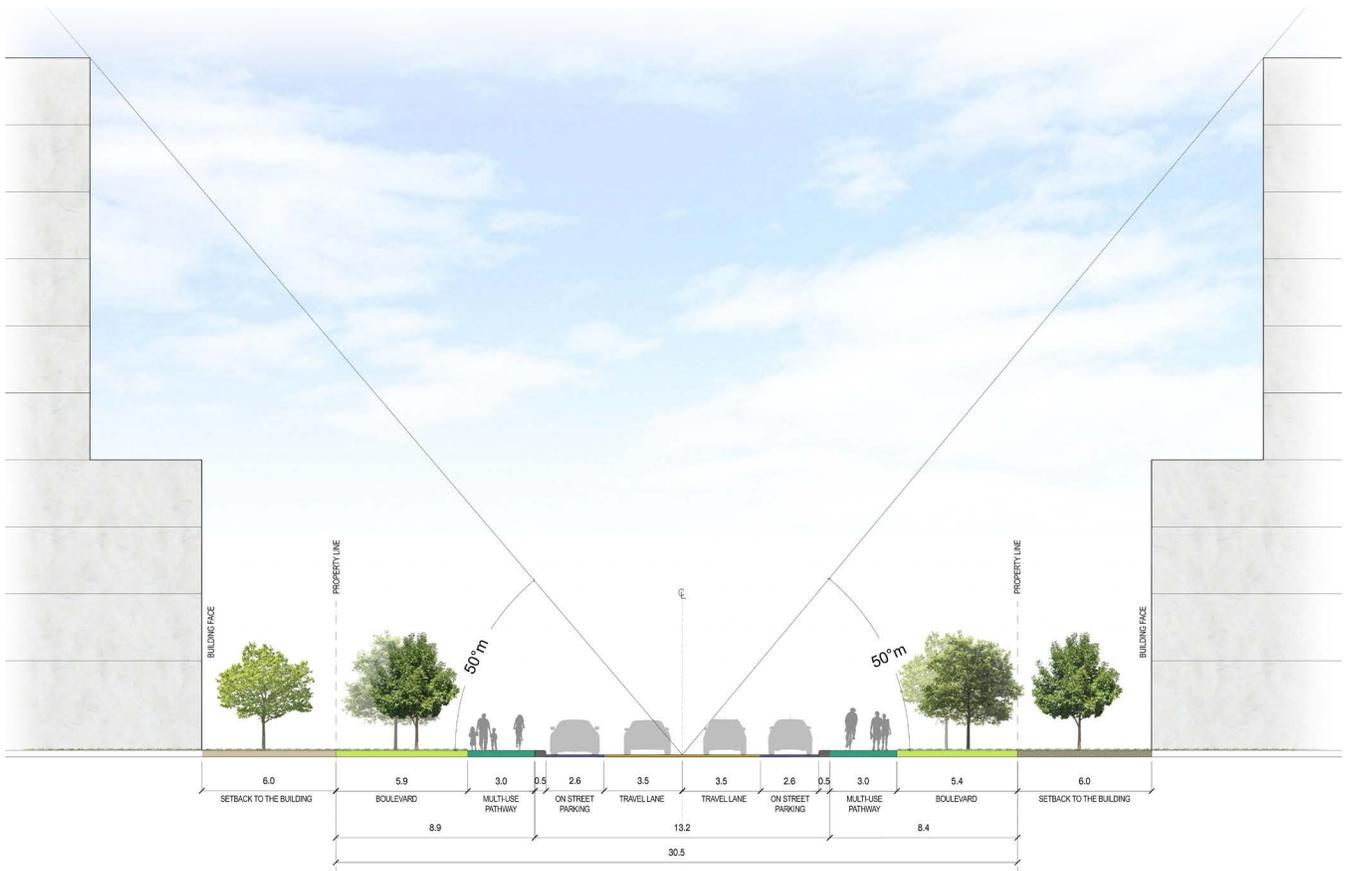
Proposed Angular Plane to Silvercreek Parkway
